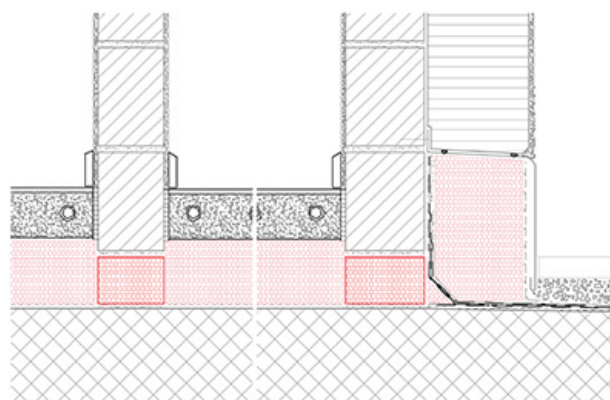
Thermal bridges in constructions can be broken by insulation elements, shown in red here
